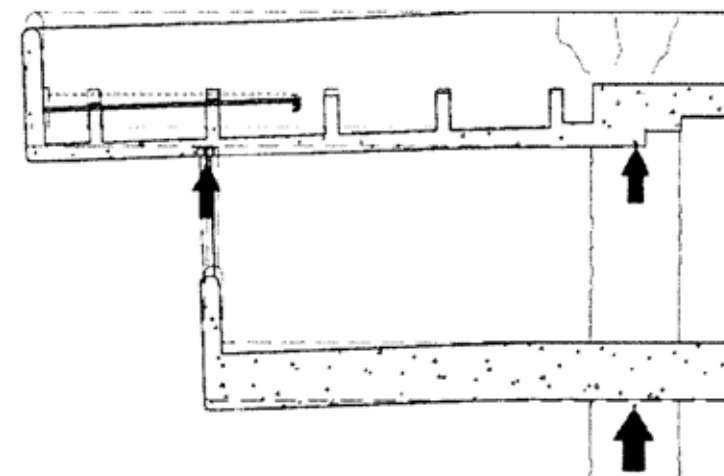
Diagram of loading and existing cracks along the parapets of upper cantilevered terrace. (Source: Ceraldi, Theodore M. "Stabilizing the Falling of Falling water: A Structural Rehabilitation Proposal for The Master Terrace". 1999 ACSA-CIB TECHNOLOGY CONFERENCE).
